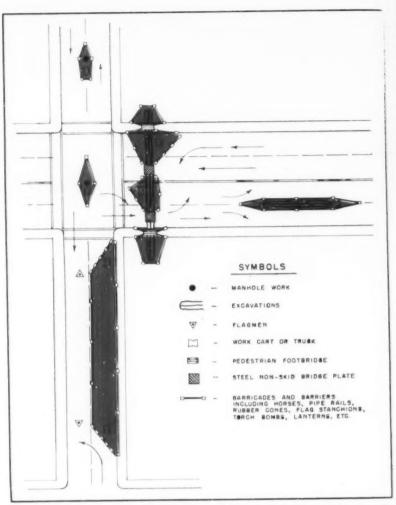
When street construction, including excavation, is under way, devices for traffic protection and control should be provided, essentially as shown.
